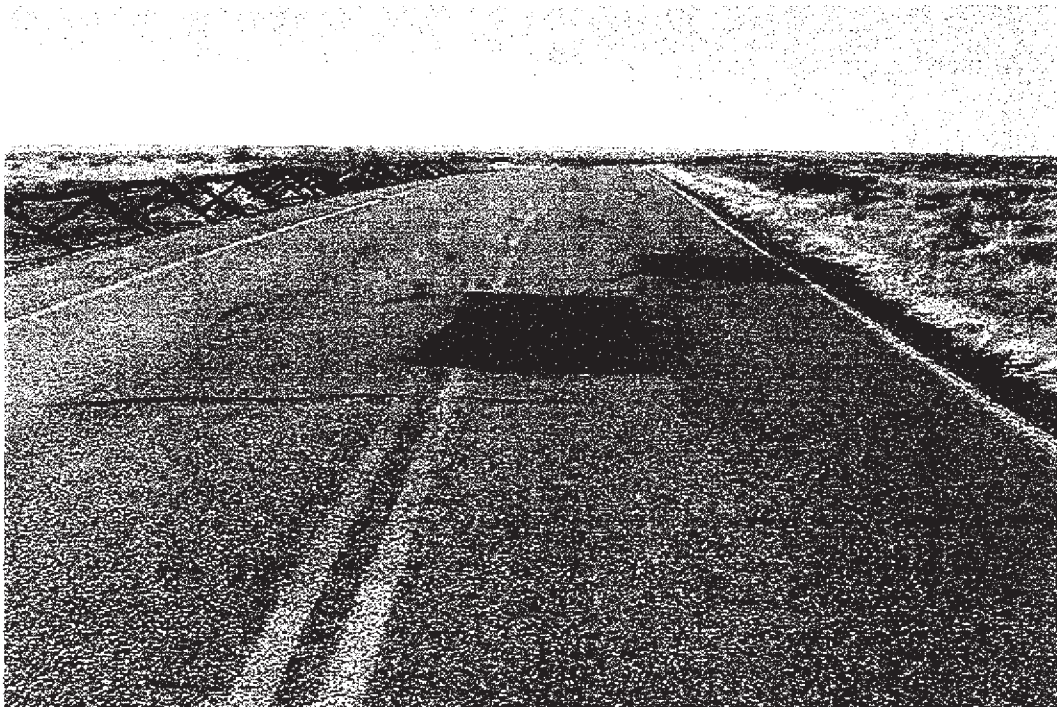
MP 23.70 - Typical Pavement Section, Note Patching
